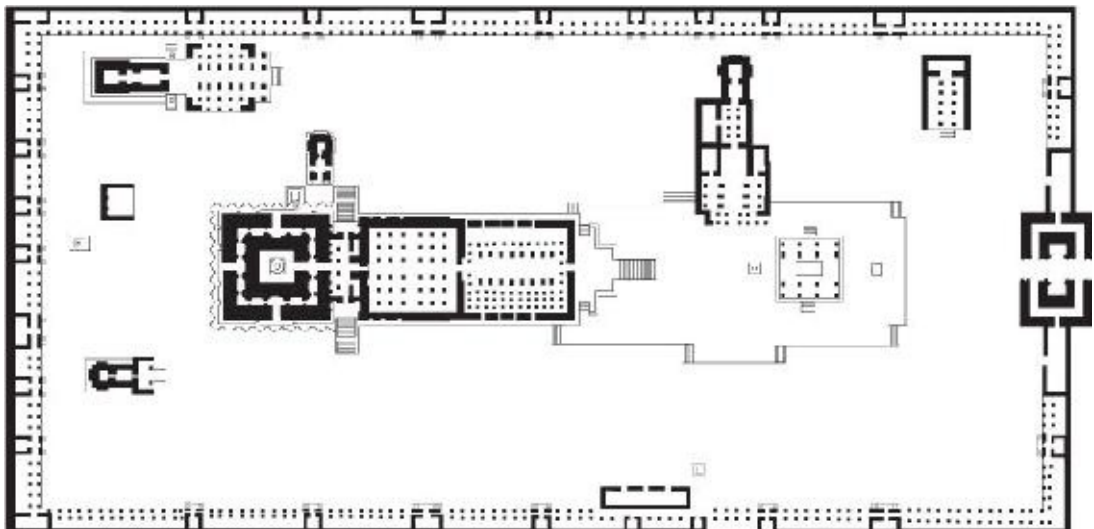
PLAN OF BRIHADISHVARA TEMPLE
